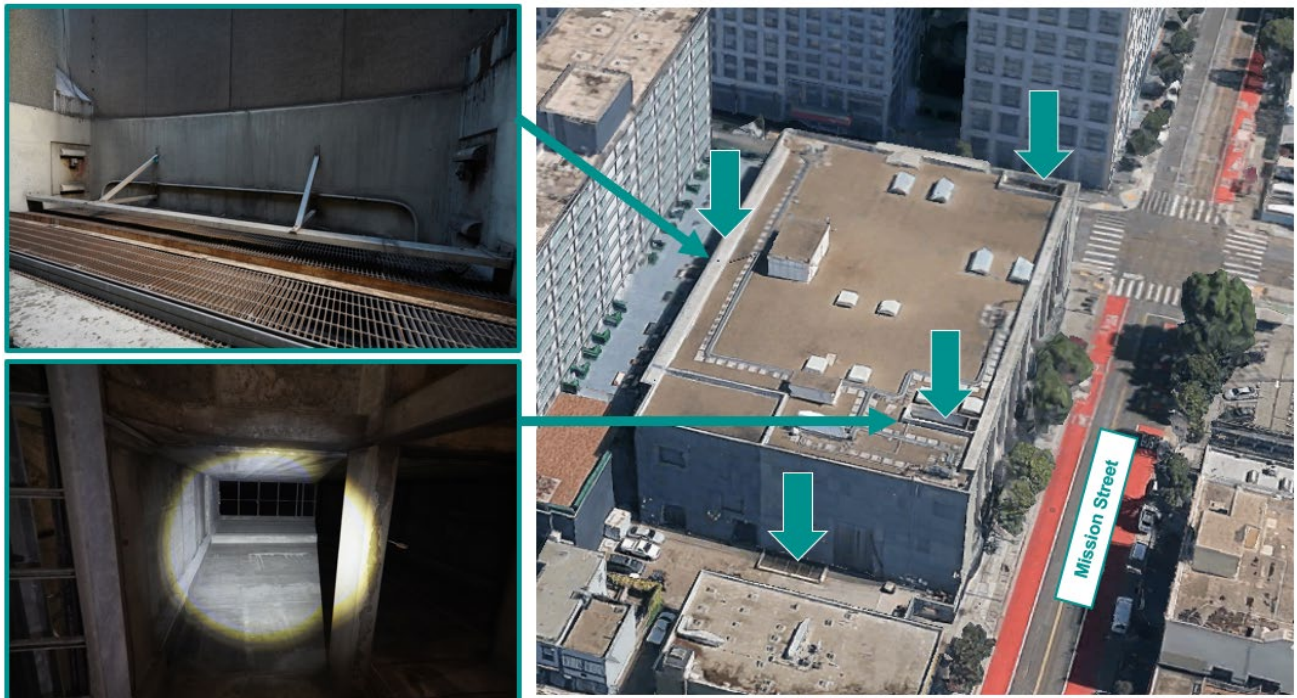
North is to the left of the aerial image. Indicated by vertical arrows are four exterior intake locations; two large openings at the roof and two below grade locations (one along the north elevation and one at the west elevation).
